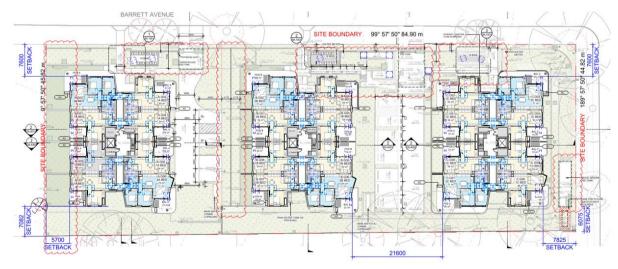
Proposed Ground Floor Plan (source: Place Studio)
